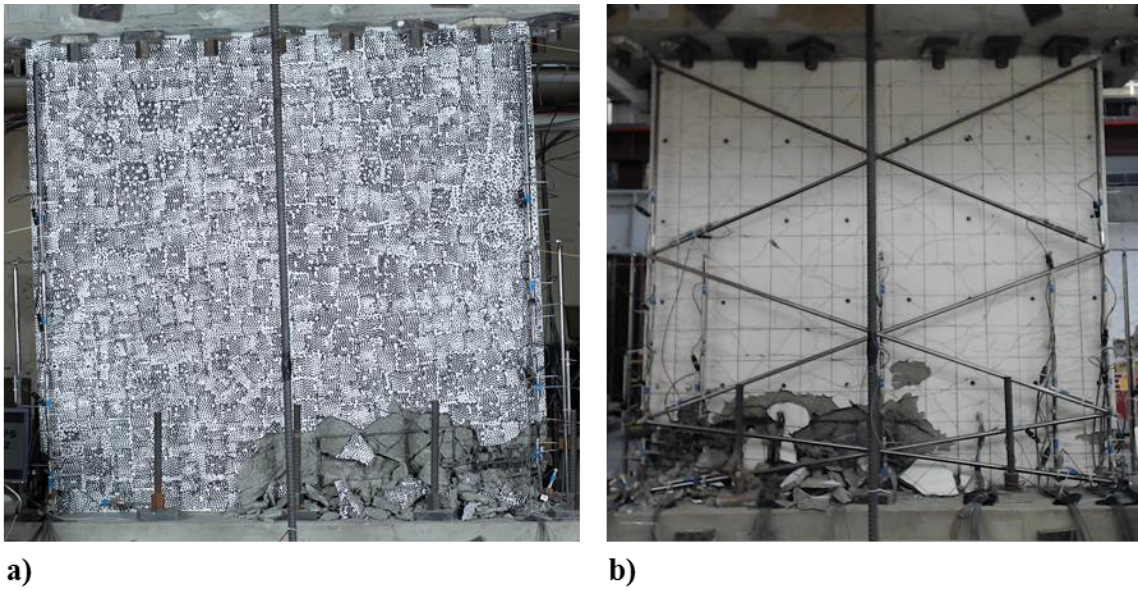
Specimen WP5 – a) Photo of front (south) face of specimen after test; and b) Photo of rear (north) face of specimen after test
